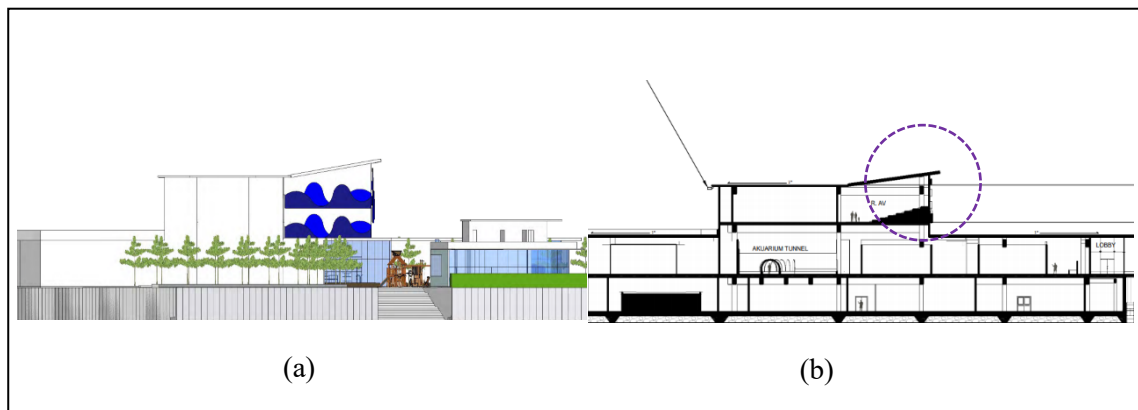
(a) East Facade, (b) Cross-Section of The Building
